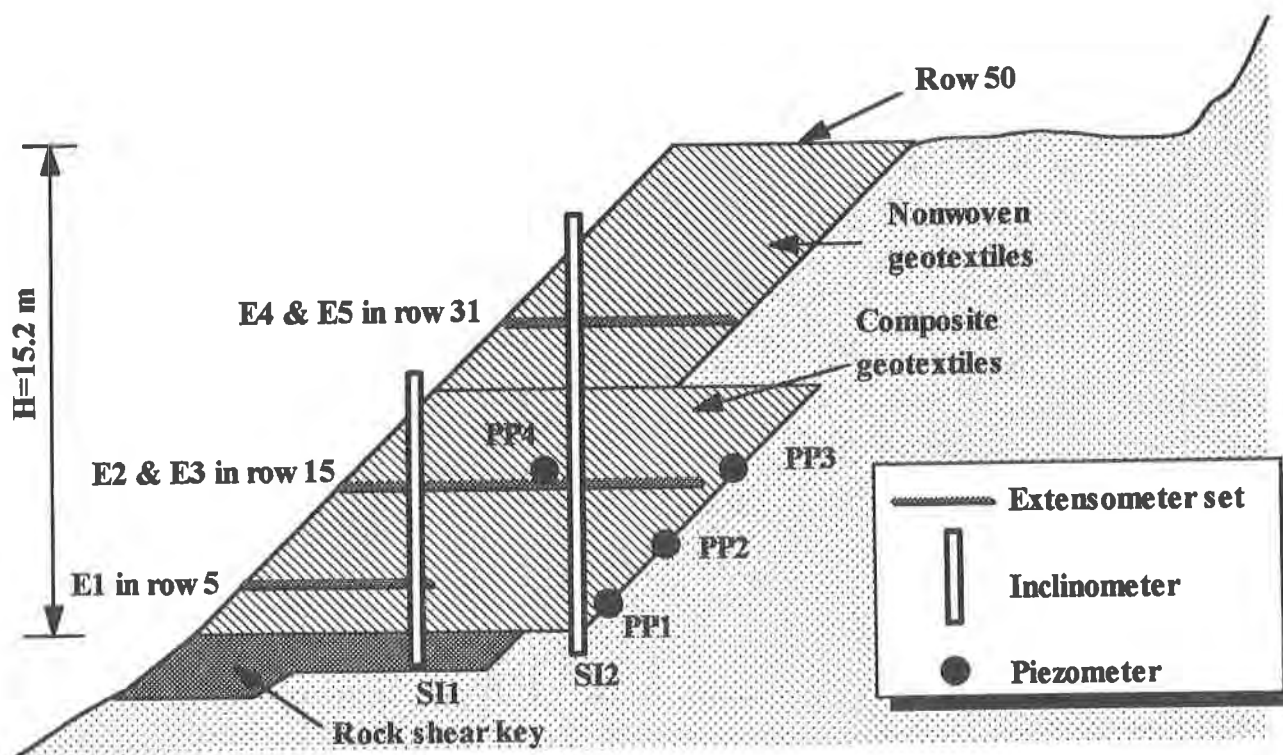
Cross section of the reinforced slope showing the instrumentation layout
